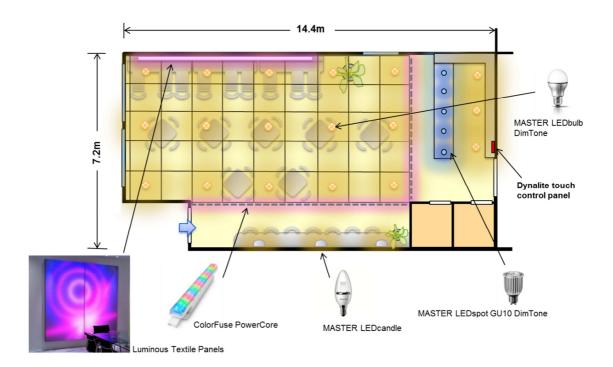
EXAMPLE OF LIGHT PLAN OF BAR AND RESTAURANT
